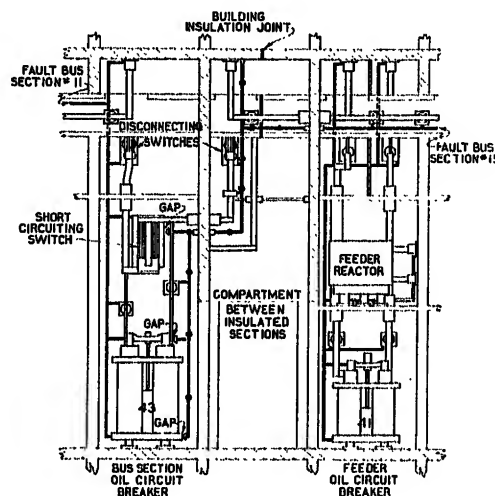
LOCATION OF DISCONNECTING SWITCHES
